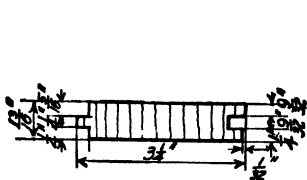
Section of 1 × 4-in. tongue and grooved flooring.
